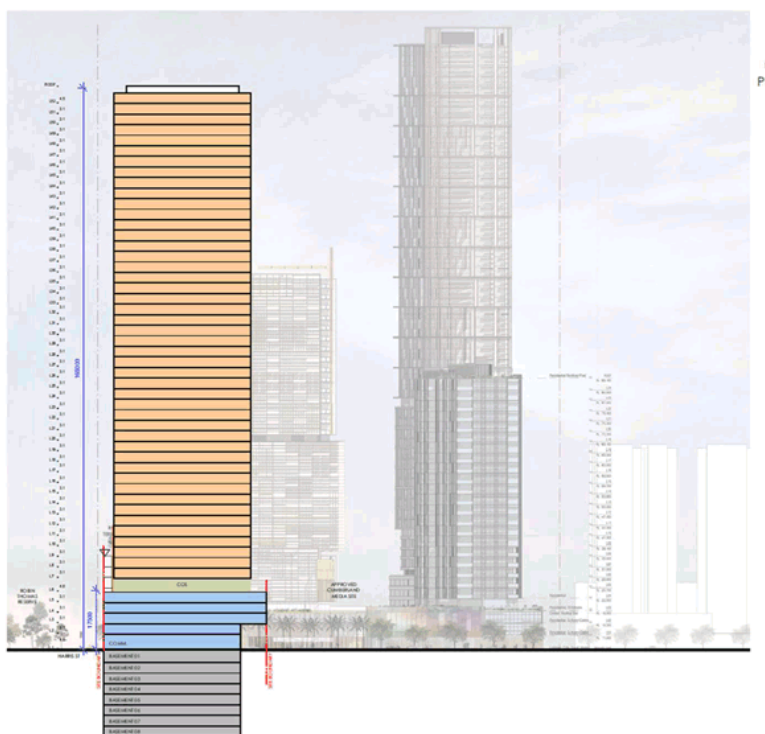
Planning Proposal for the Albion Hotel site in context with Planning Proposal for the adjoining site - Cumberland Industries site (Source: Applicant's Urban Design report).
